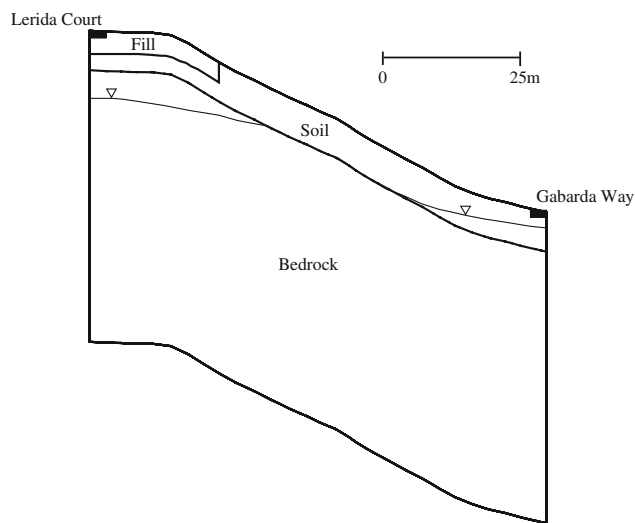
Average vertical cross section (long profile) of the Lerida Court site before the failure (after FBLA 1973). The cross section is approximately representative of a cross section through A–B in Fig. 2
